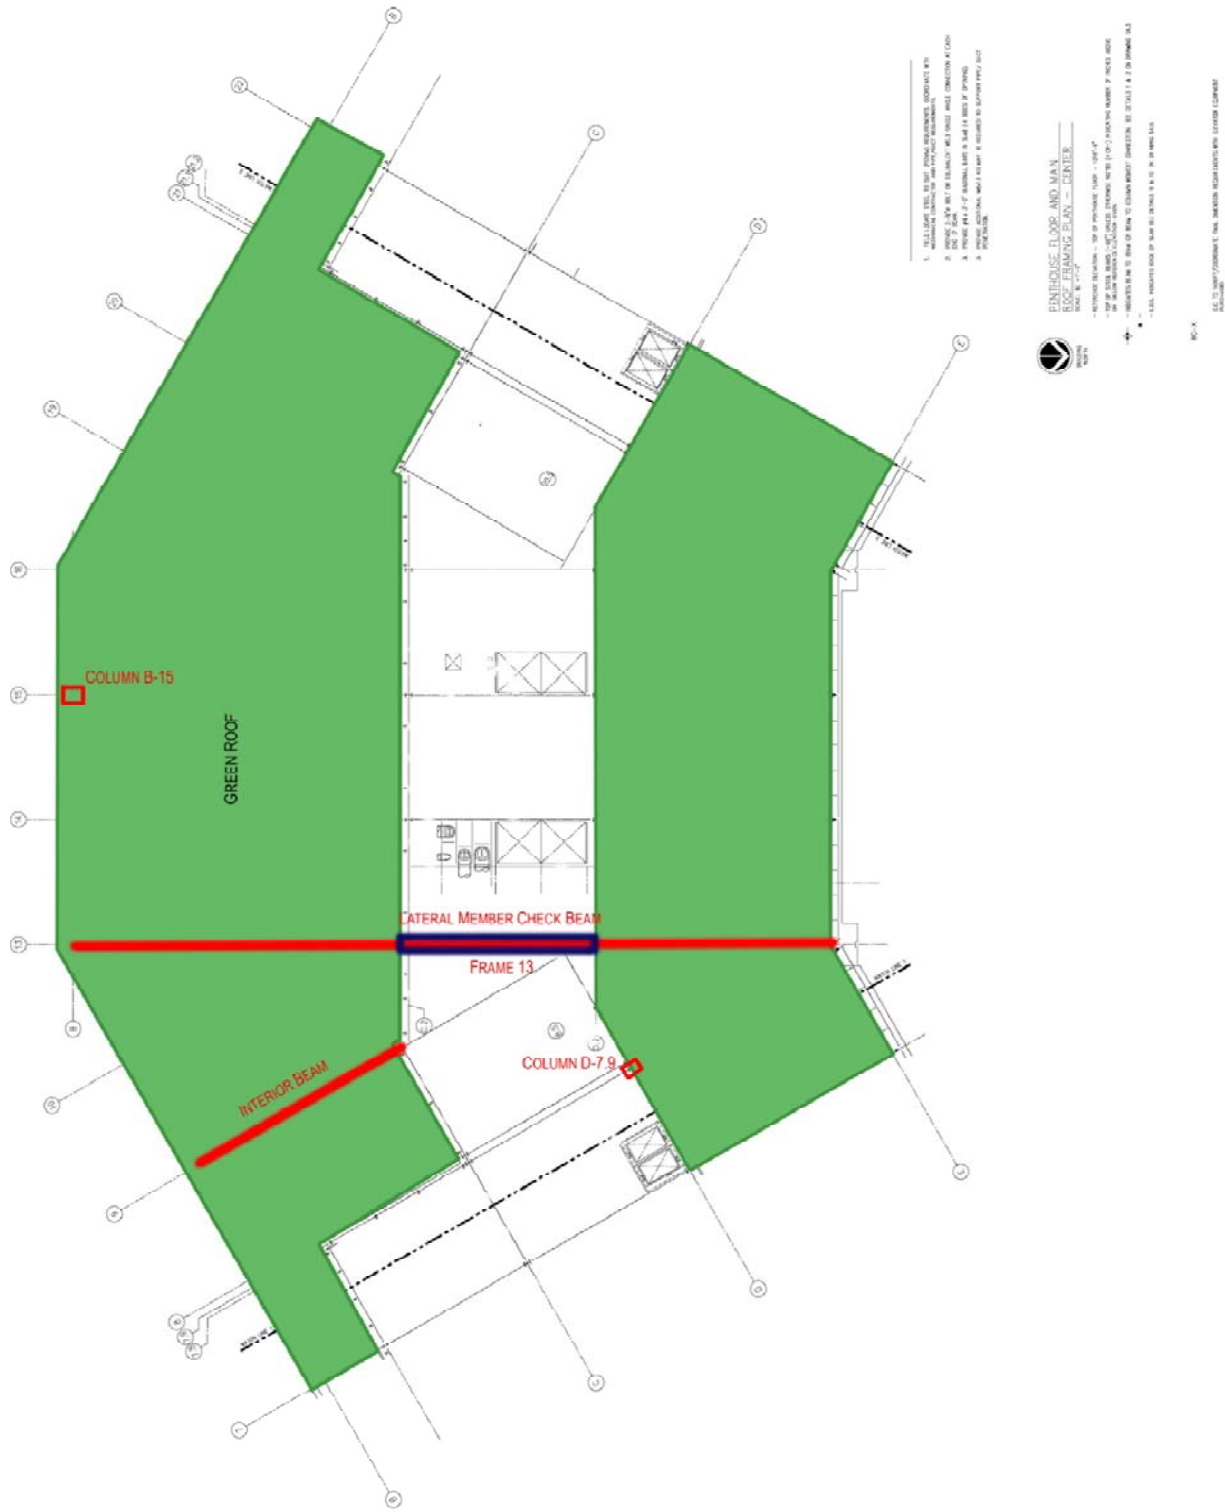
Green Roof Plan Center of Redesigned Building with Portal frame Analysis, lateral Beam Check, Interior Beam Check, and Spot Checked Columns Indicated
